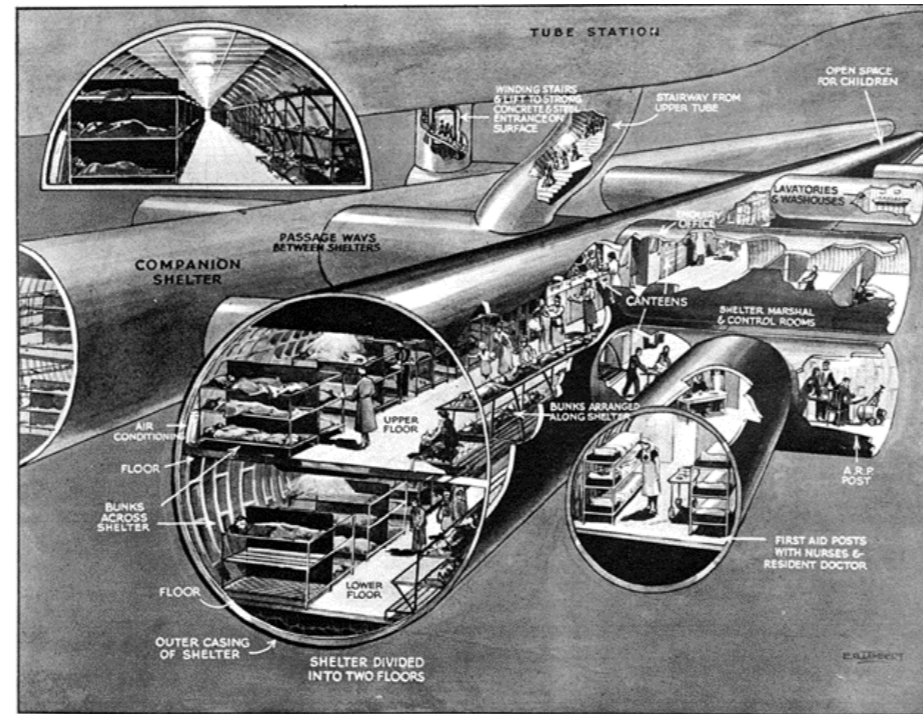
Cross section of deep level shelter arrangement and entry points.
